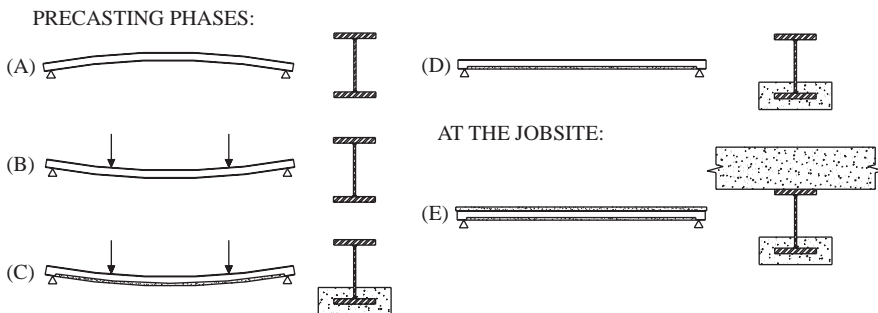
Phases of construction of Preflex beam: A) assemblage of the steel beam; B) predeflection of the steel beam; C) pour of the concrete flange; D) release of the composite beam; E) pour of the concrete deck slab.
